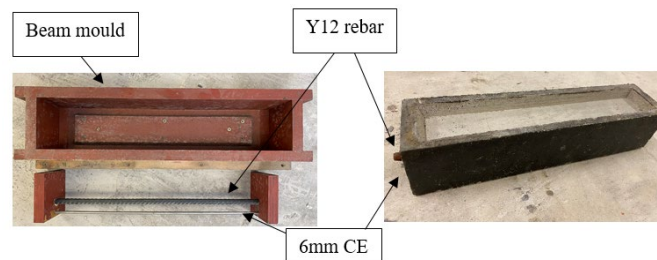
Beam mould, CE, rebar and specimens – Series 1
